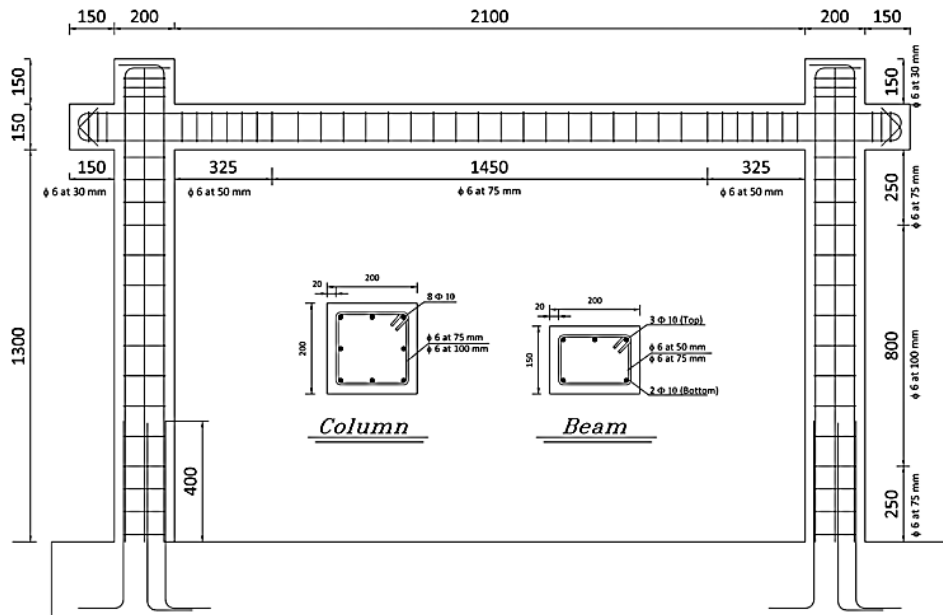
Geometry and reinforcement details of the reinforced concrete frame and infilled masonry wall (dimensions in millimeters) [26].
